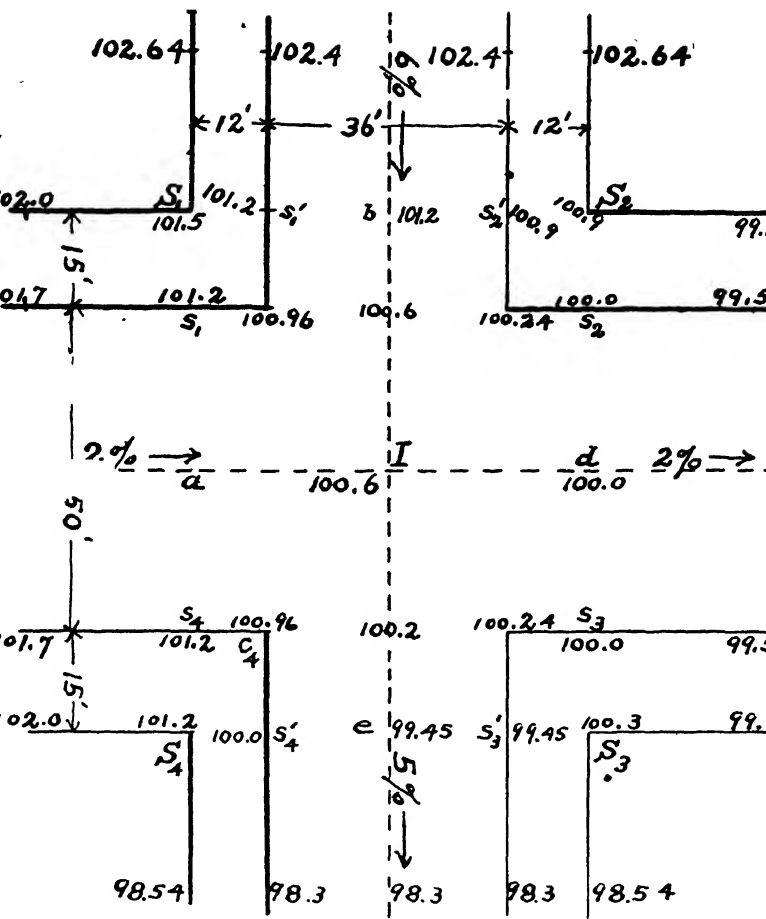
CALCULATING STREET INTERSECTION GRADES
